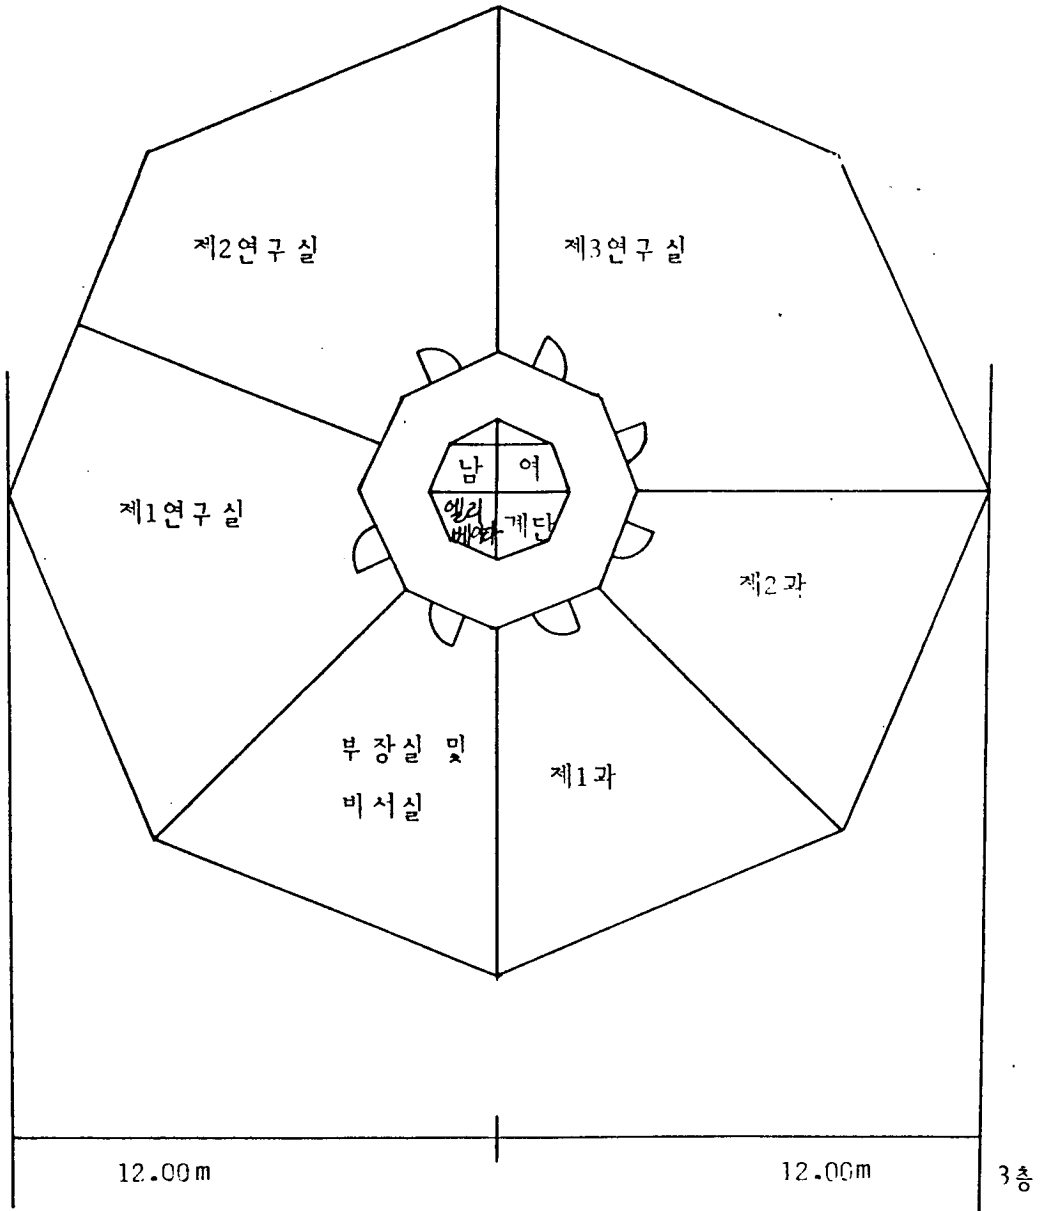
The third floor arrangements of the proposed polar research building.
